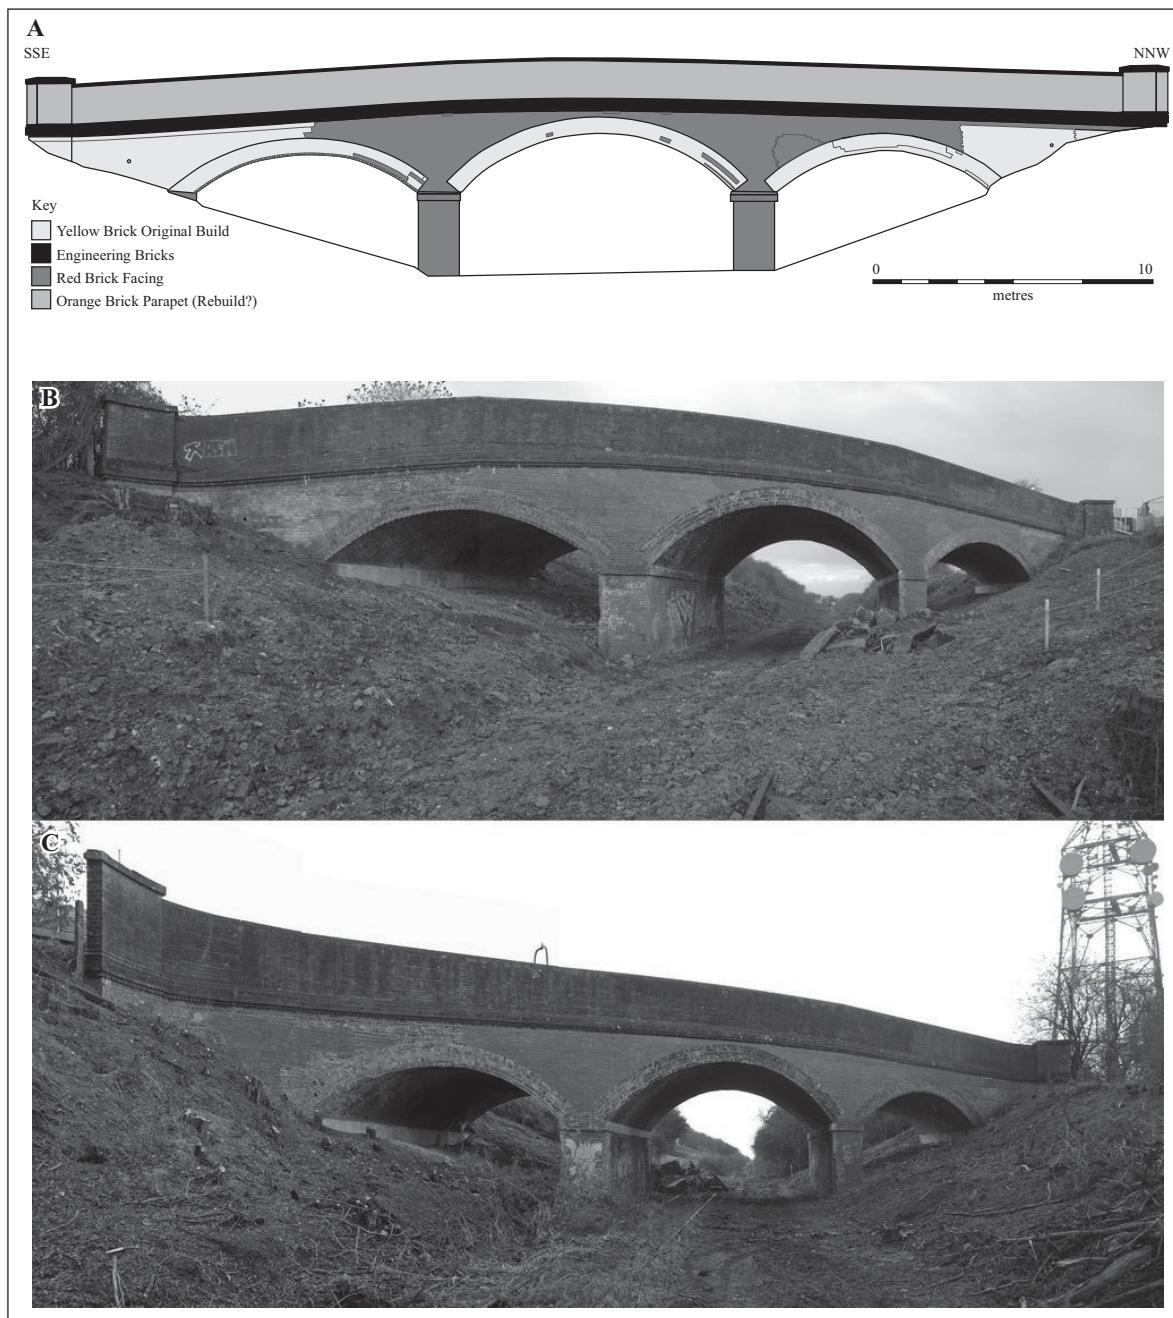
Windmill Bridge, Over Road: A. east facing elevation with brick types; B. east facing elevation; C. west facing elevation.
